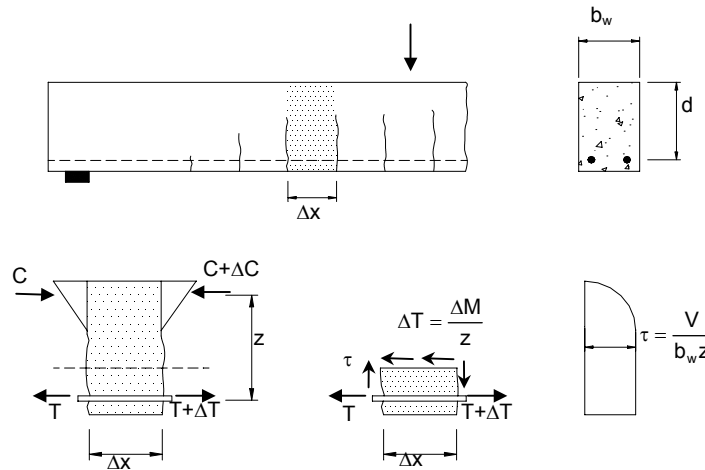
Shear stress distribution in a reinforced concrete beam with flexural cracks (adapted from Collins and Mitchell, 1997).
